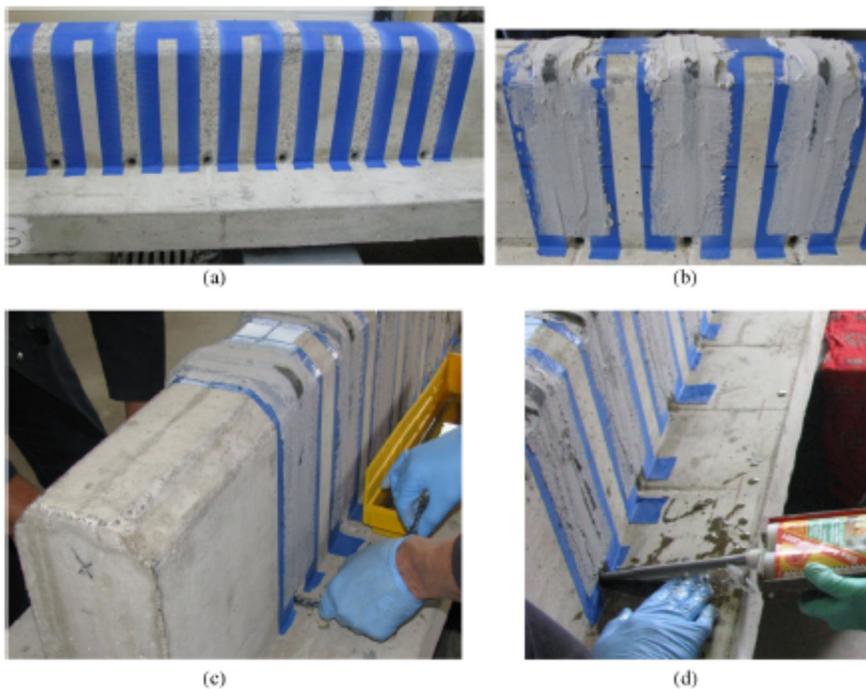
Installation procedure for the CFRP rope anchorage system [92]
